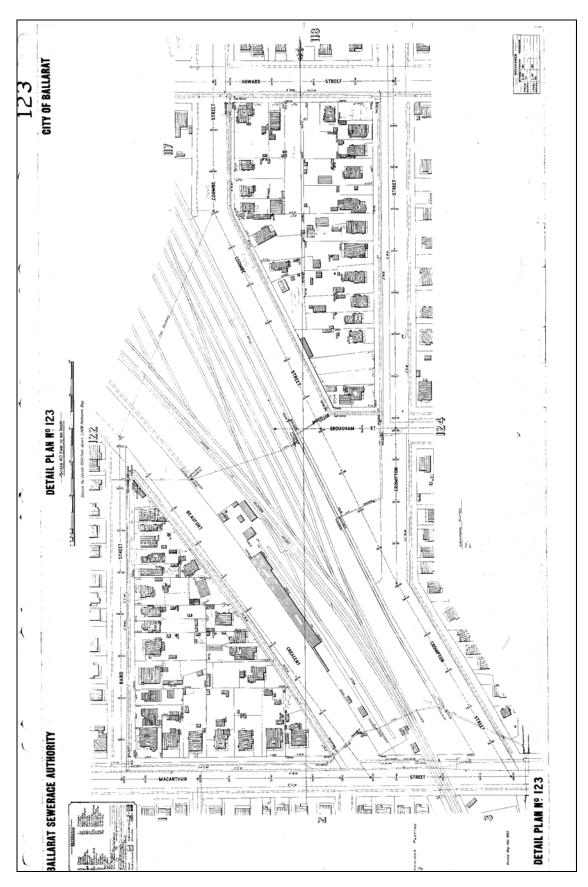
Ballarat Sewerage Authority Plan, 1931. Source: Planning Department, City of Ballarat.
